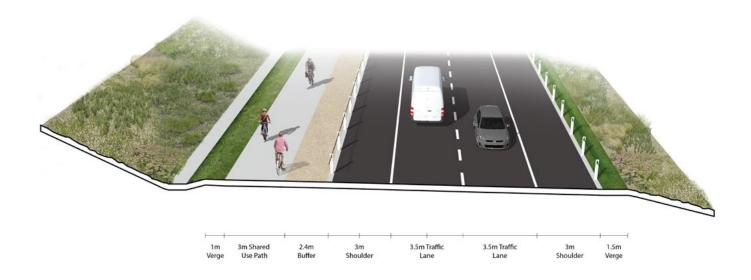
Southern Connector Road structure plan. Credit: Jensen PLUS
